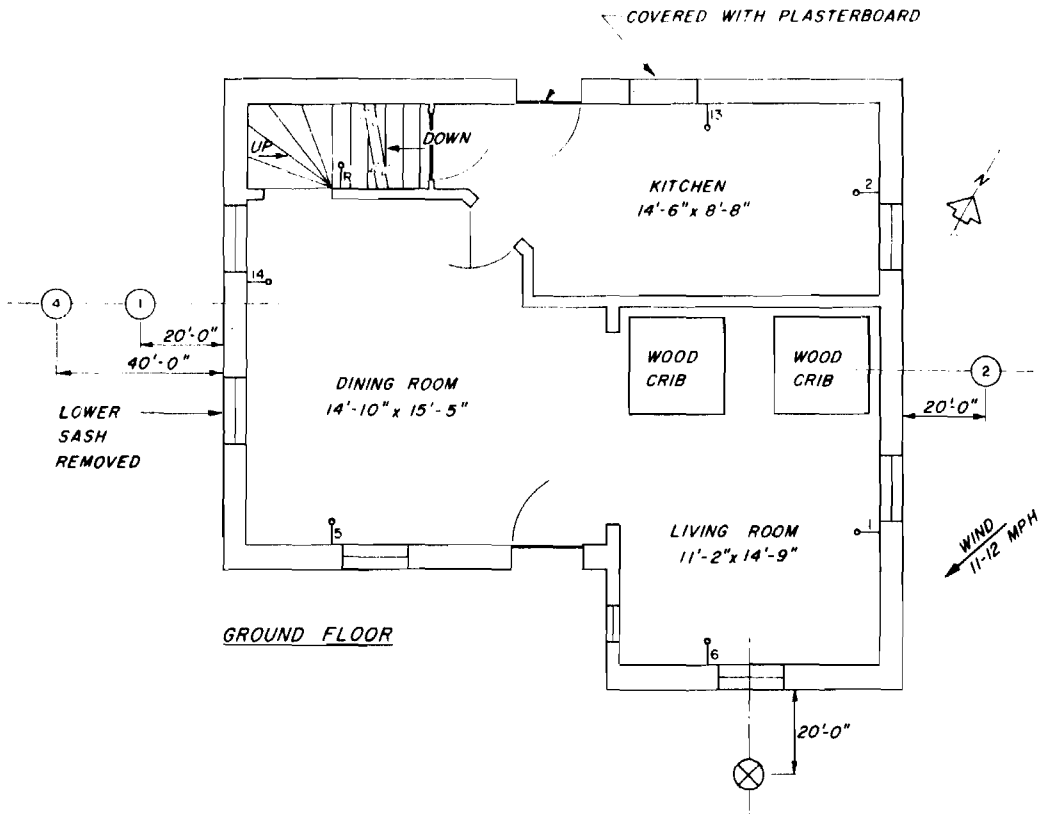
BUILDING No. 3 - TWO-STOREY SOLID BRICK DWELLING
